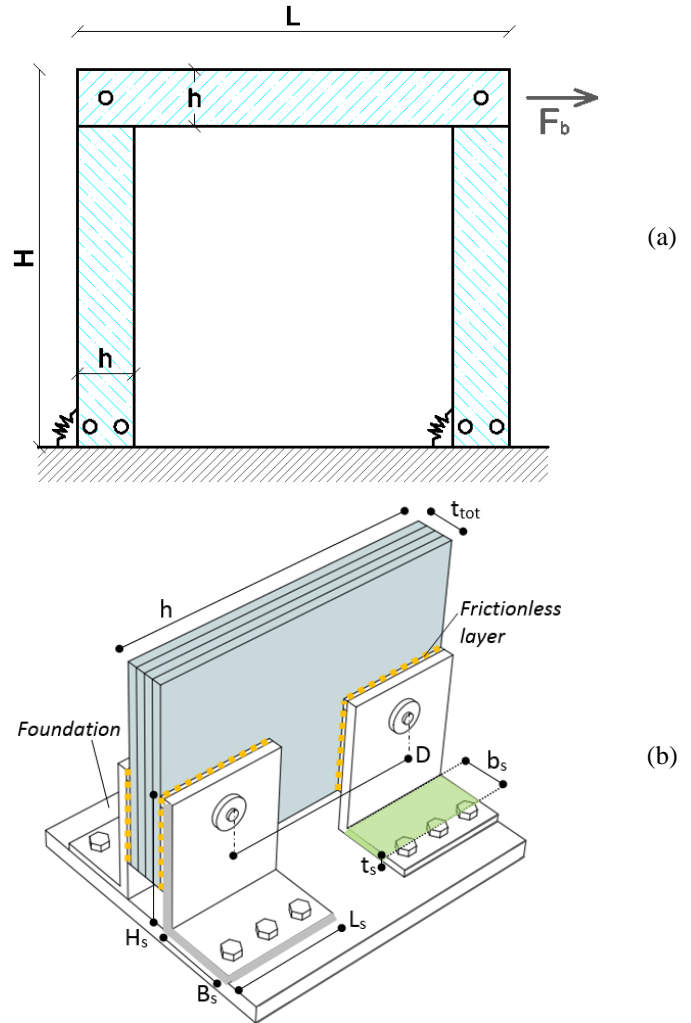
Case-study glass frame: (a) lateral view and (b) detail of the base connection.
